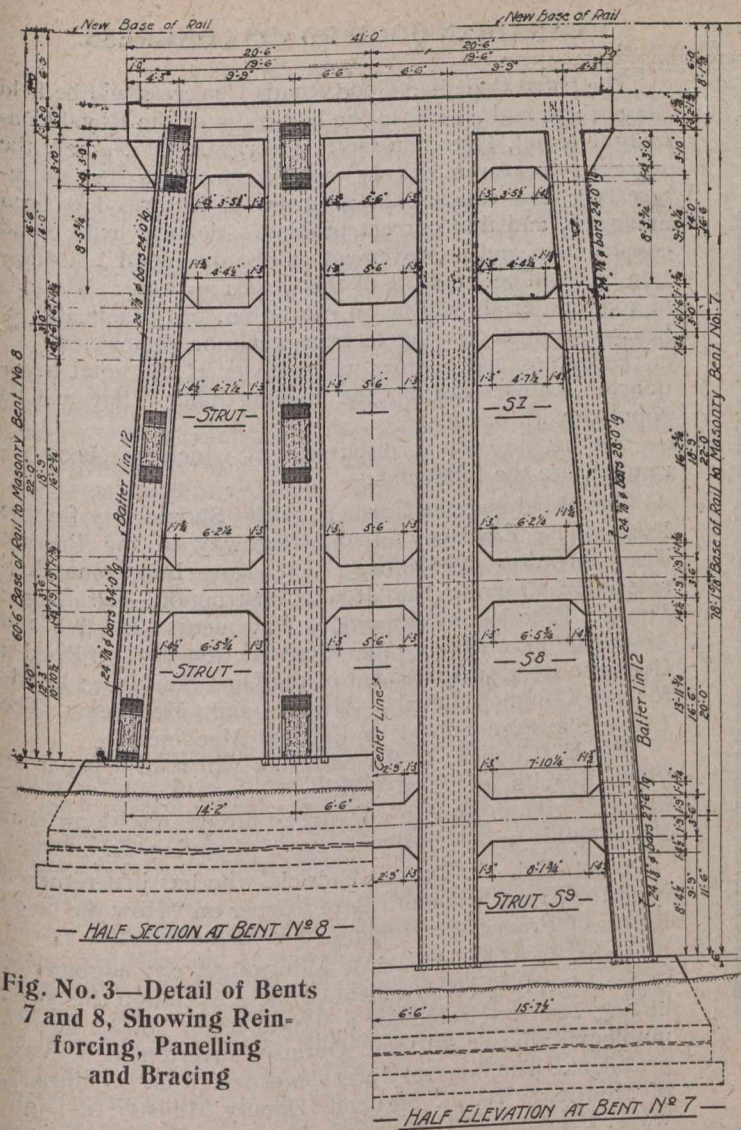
Detail of Bents 7 and 8, Showing Reinforcing, Panelling and Bracing
